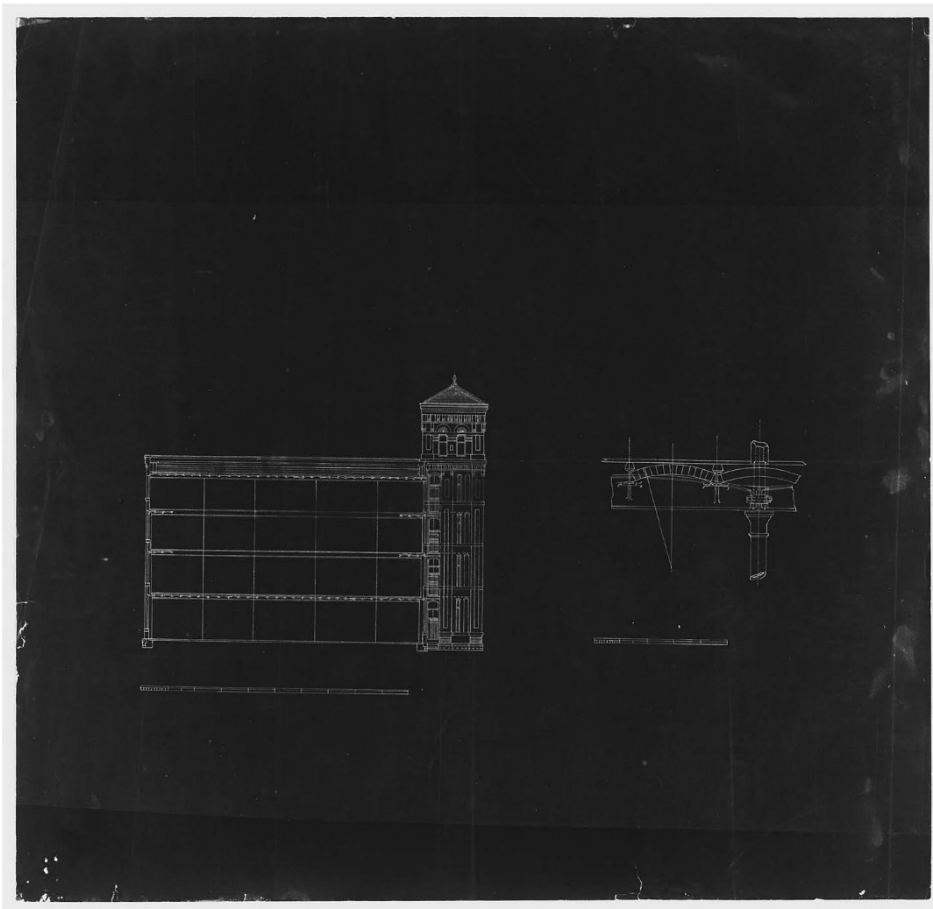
Section and fireproof-floor detail, Mill No.3 at Osaka Bōseki [2-17]
